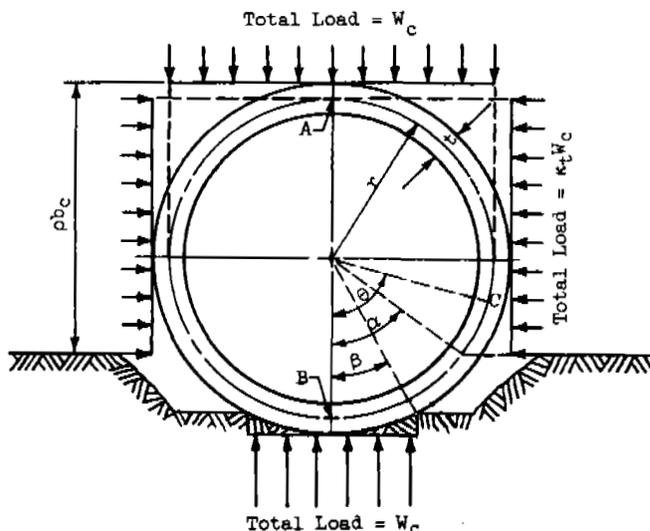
Assumed load distribution on an underground conduit installed on a projecting bedding
